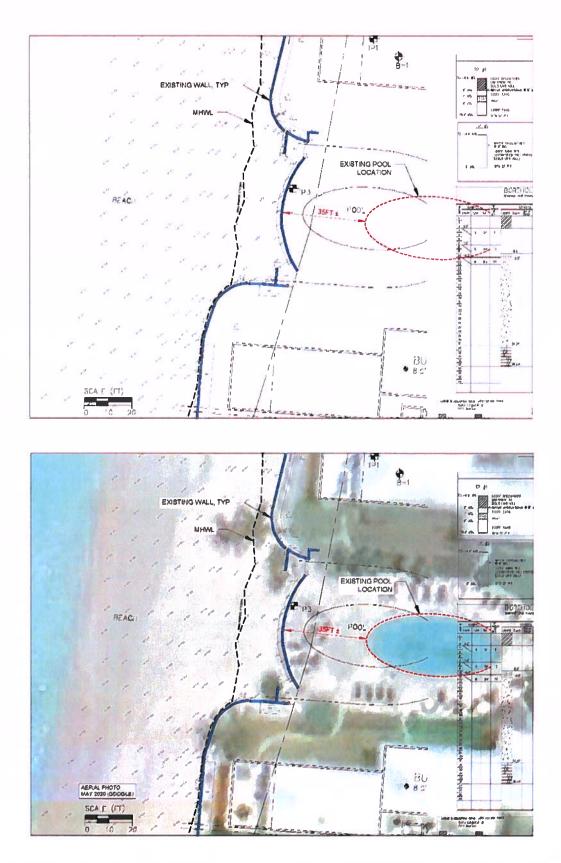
Location of existing seawalls, highlighted in blue, reproduced from the Nov 2020 plans. (We added the May 2020 aerial photograph as an underlayer, in the lower figure.) Note that the location of the pool in the submitted permit application drawings is shown as 35 feet seaward of its actual location.
